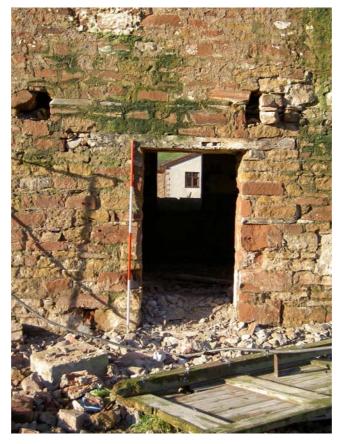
Re-used timber 1 used as a lintel above the south-western doorway in the north-east elevation of Building A
